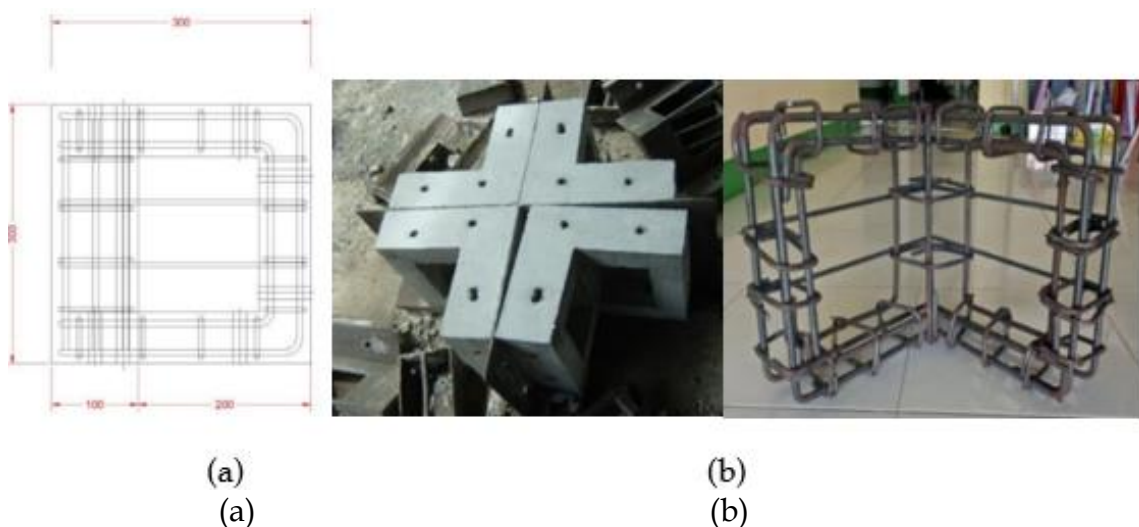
Component and Reinforcement Details for P3, Consists of its Rebar Detailing (A) and Real-Life Example (B)
